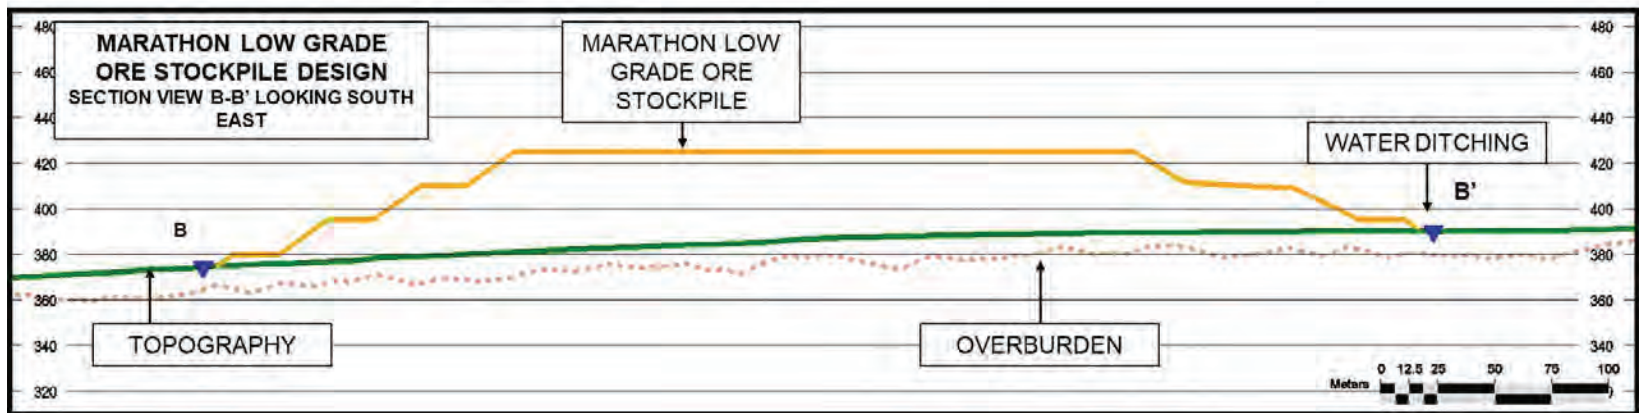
Marathon Low-grade Ore Stockpile Design – Section View B-B' Looking Southeast
